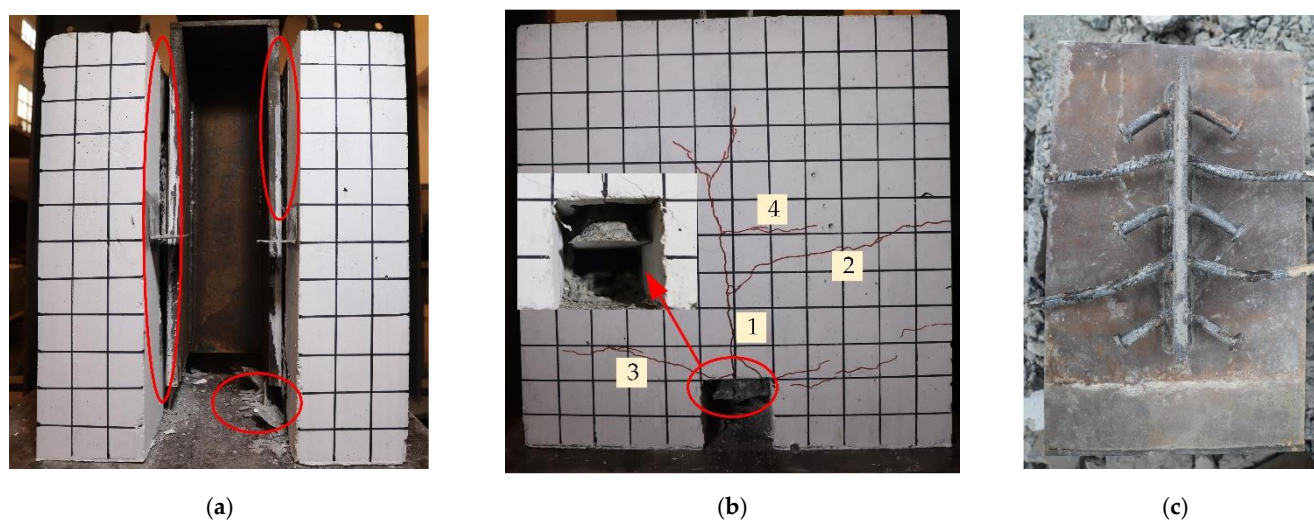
Failure modes of composite connectors without end-bearing concrete: (a) front of concrete slab; (b) side of concrete slab; (c) perforated steel plate.
